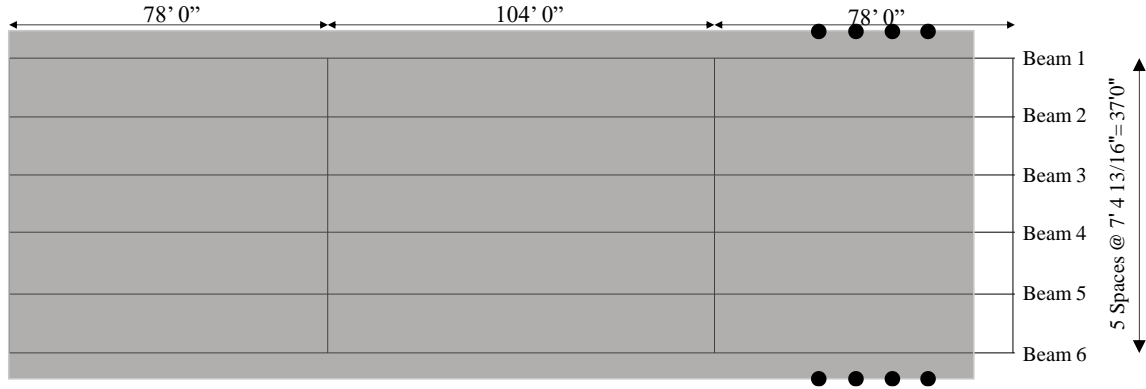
Span 3 vehicle and wet concrete load for 260 ft Standard Bridge
